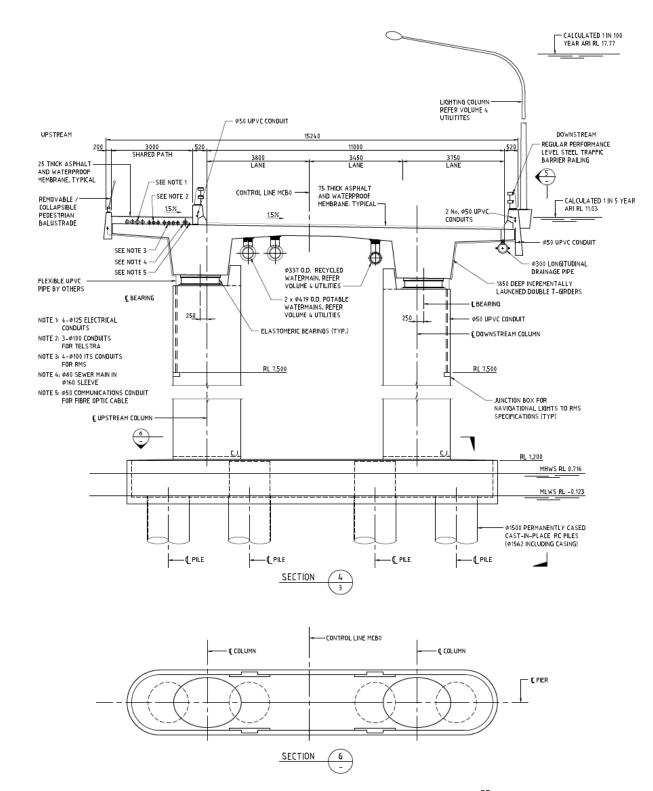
Cross section of the proposed bridge piles that proposed . 25
